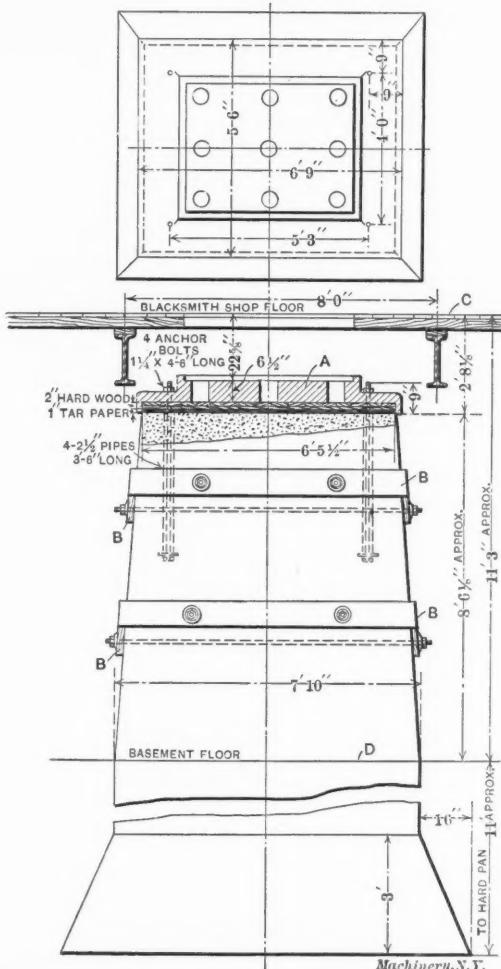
Concrete Foundations for Drop Hammers in the Pratt & Whitney Co.'s Blacksmith Shop.
